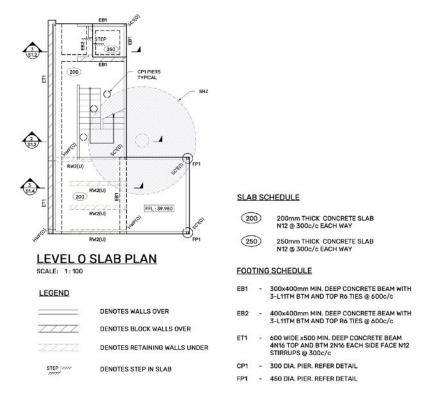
Engineer's plan for footings around existing Tree 4 (Greenwood Consulting Engineers)
